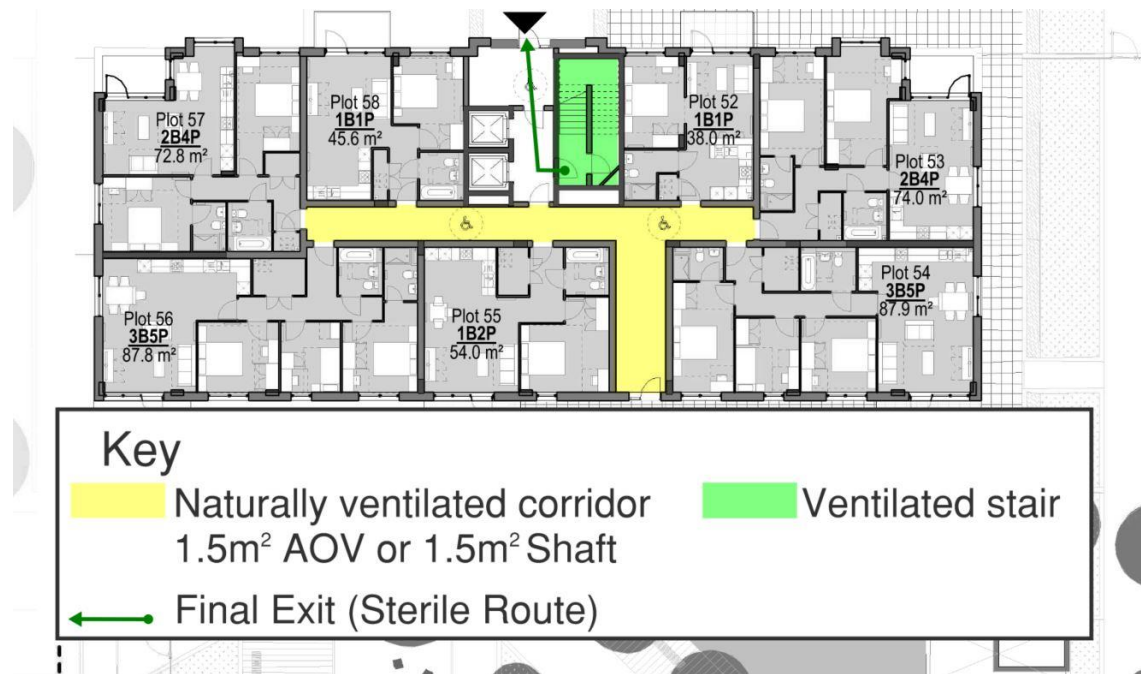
Means of escape direct to outside via protected exit passageway - Block B1
